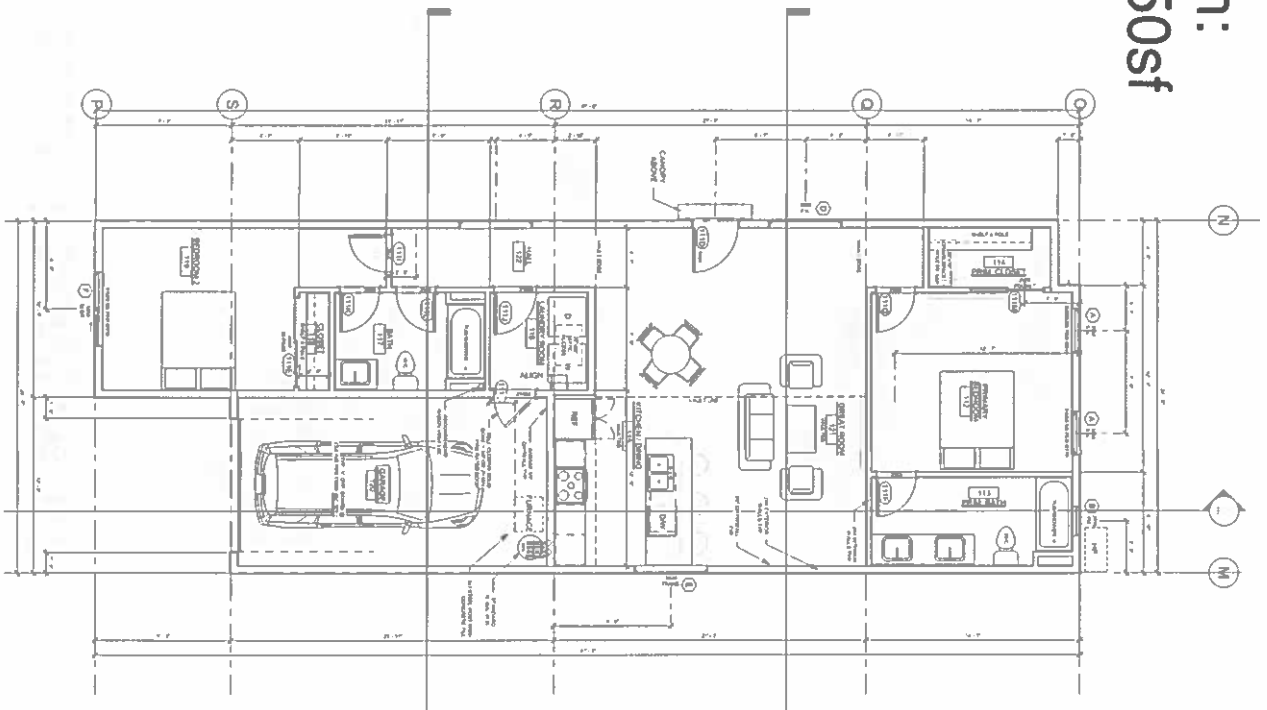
EXHIBIT B: THD REVISED CONCEPTUAL MASTER PLAN
